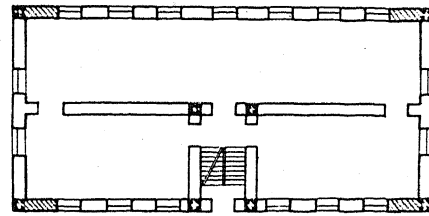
STRENGTHENING OF BRICK BUILDINGS WITH REINFORCED CONCRETE POSTS AS IT ACCEPTED IN YUGOSLAVIA
